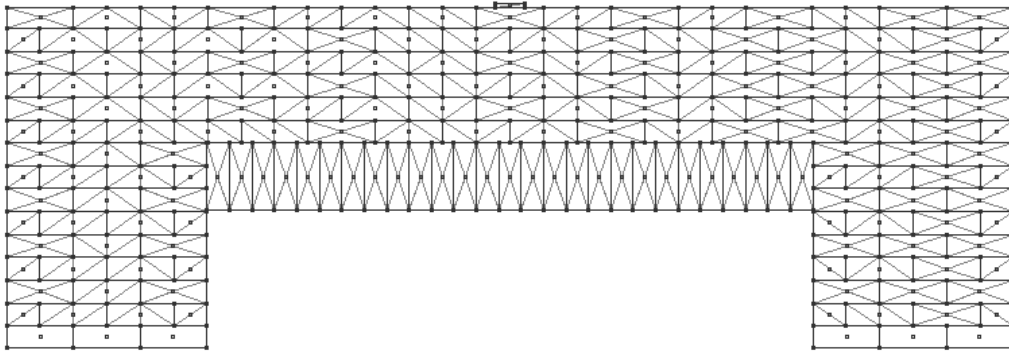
Typical UDEC geometric model of a masonry wall panel with a 2.025m opening.
